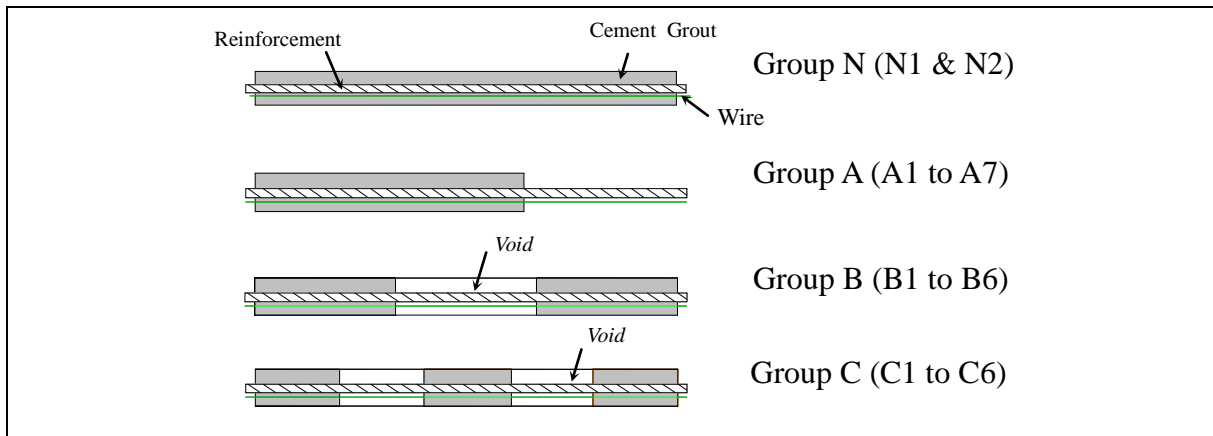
Configurations of the Prefabricated Soil Nails with Grout Defects (Grout Pipes Not Shown for Clarity)
